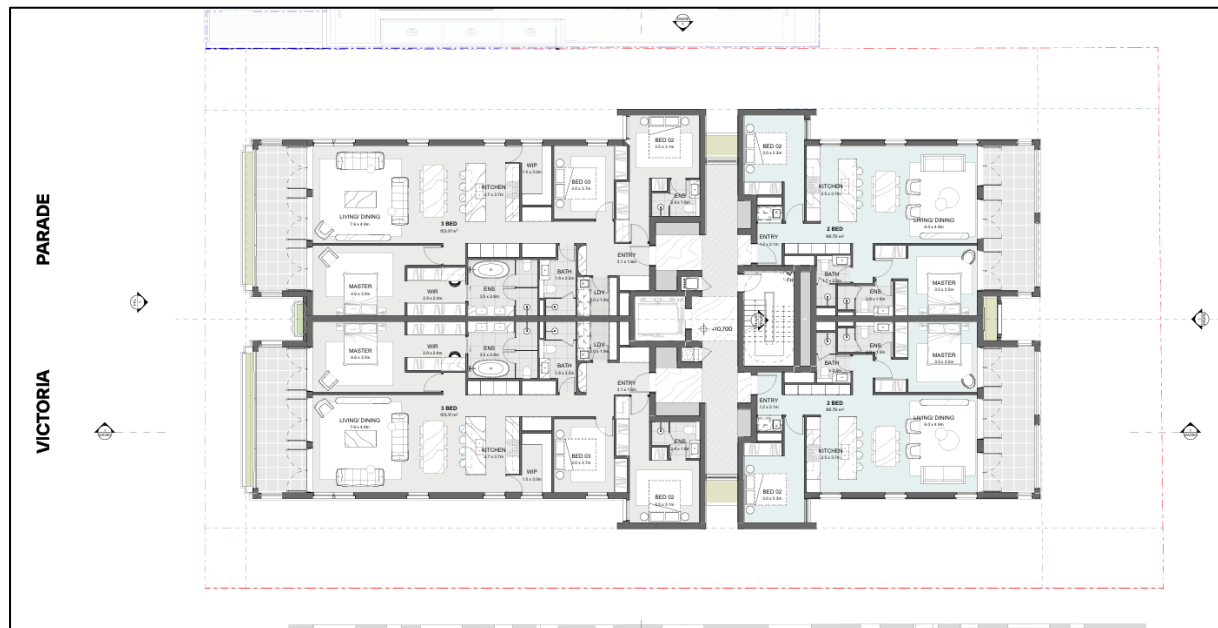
Floor Plan for Level 2 (Source: PBD Architects, 2026)
